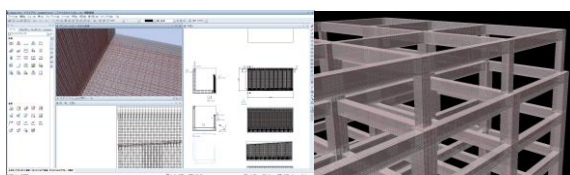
Images showing the Reinforcement bars arrangement of Takanawa house
